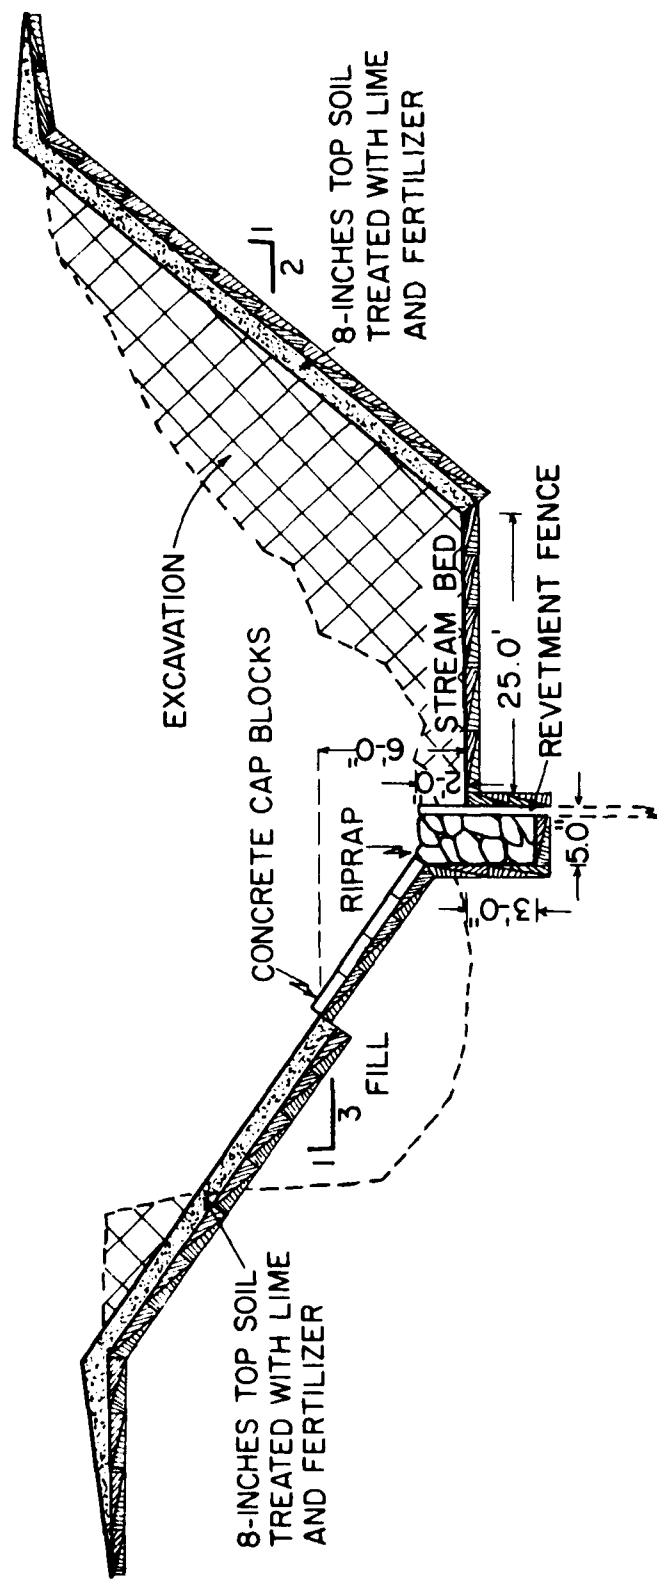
Typical Finished Cross Section of Johnson Creek Study Reach No. 4
